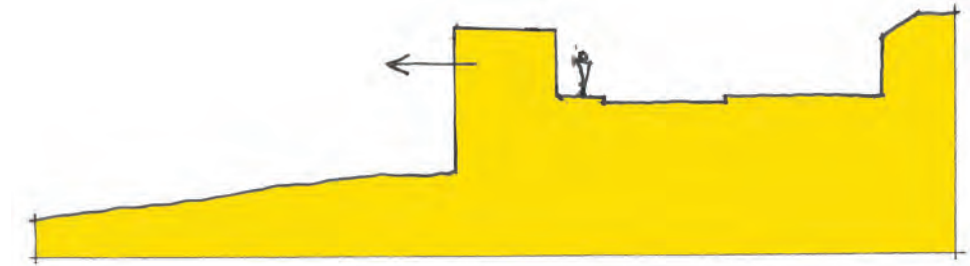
(ABOVE): Diagram of the initial response in sketch design to place new buildings on street level, blocking the view/connection to the landscape from the town. (Author)
